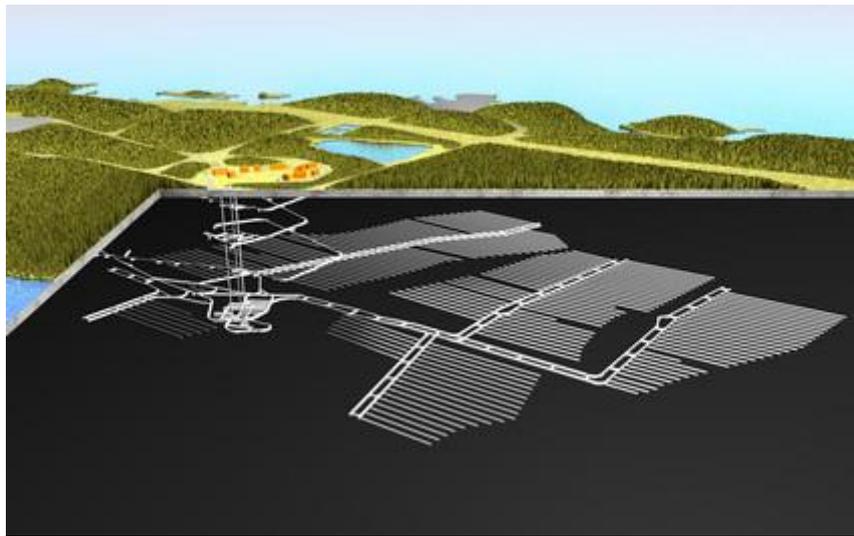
Schematic presentation showing the repository and its access routes (Posiva). Deposition tunnels are shown as parallel tunnels; all other tunnel volumes are part of the closure.
